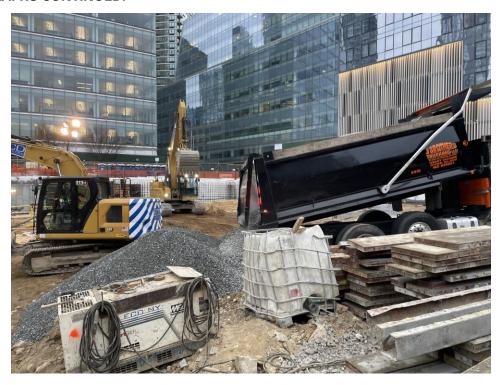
ECD importing 0.75-inch in the southern part of the site (facing southeast).
